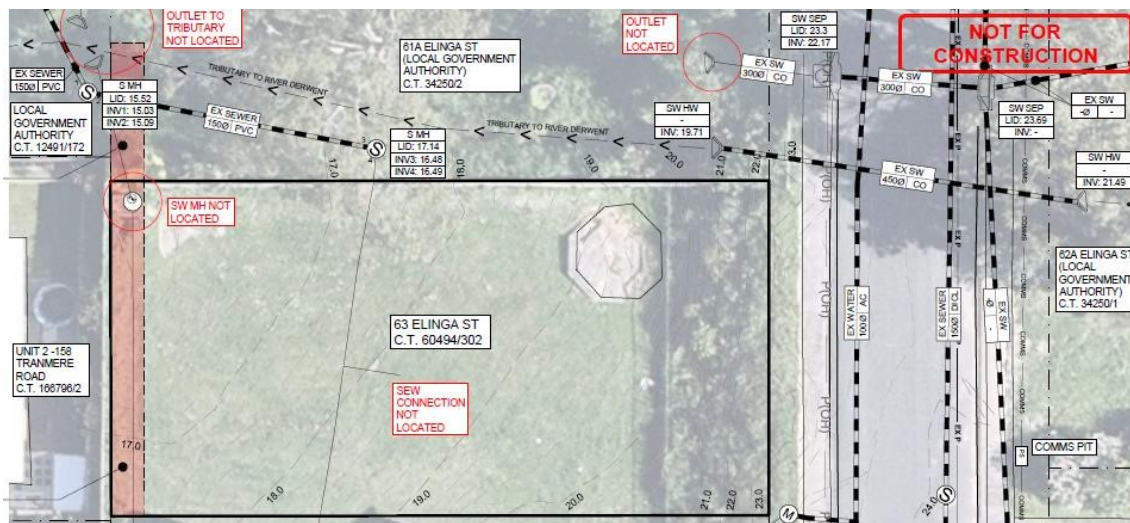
Part of existing site plan showing stormwater culverts underneath the road discharging to 61A Elinga St
